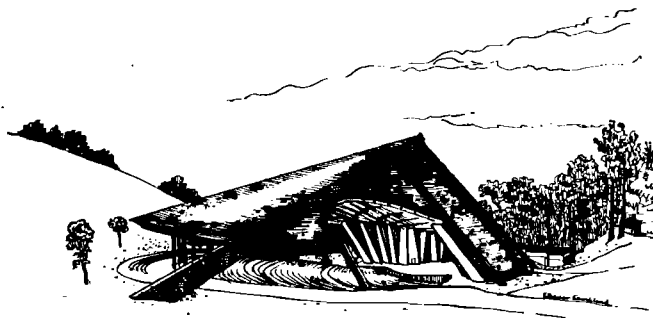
Drawing of Blossom Music Center with side of pavilion roof omitted to show orchestra shell. Peter van Dijk, architect.
